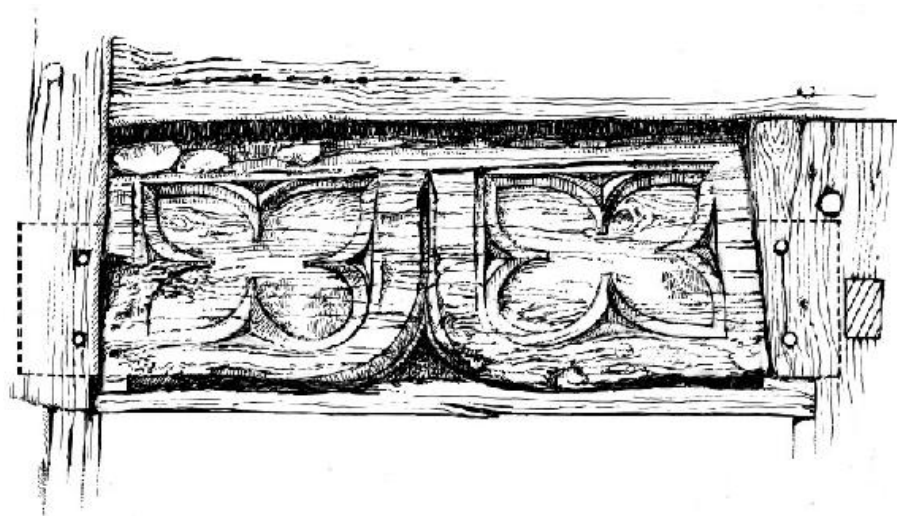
Detail of a door head in the south elevation of 41a Bridge Street
